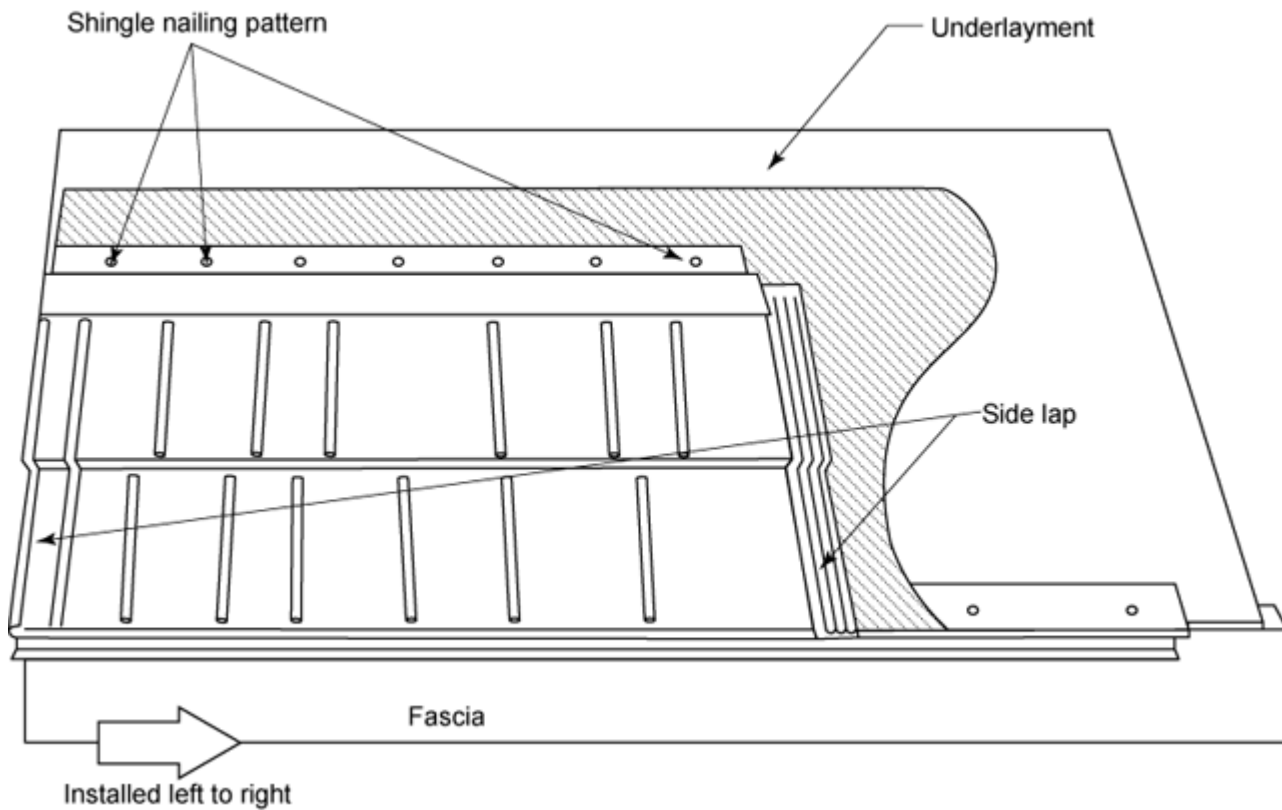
Product details for “Gerard Shingle, Granite Ridge, and Guardian Shingle”
